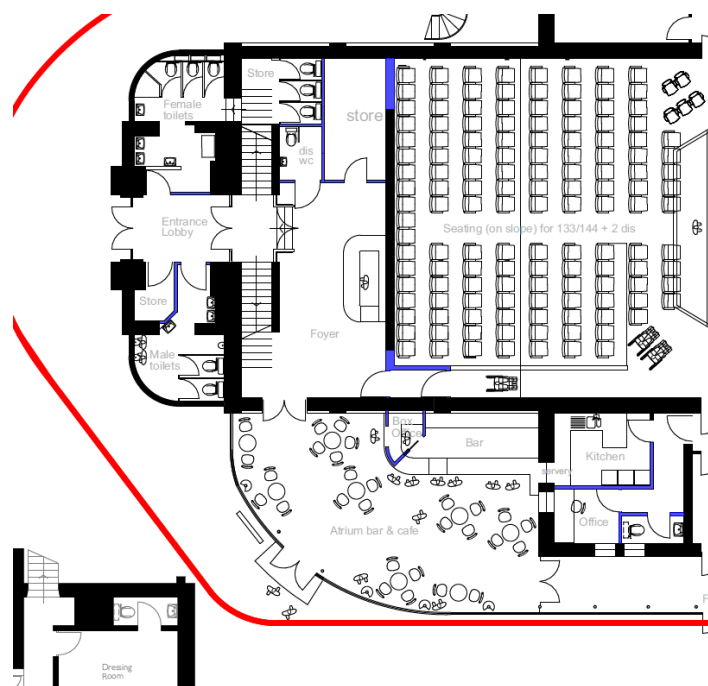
extract of the Proposed Ground Floor Plan ref. 22.20_PL100 REV C
